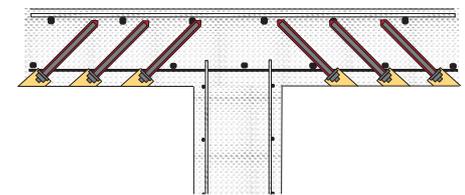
Post-installed punching shear reinforcement applied only from bottom side of the slab
